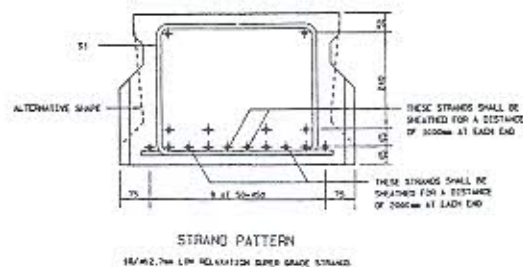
Cross section of a plank showing details of reinforcement and protruding wires
